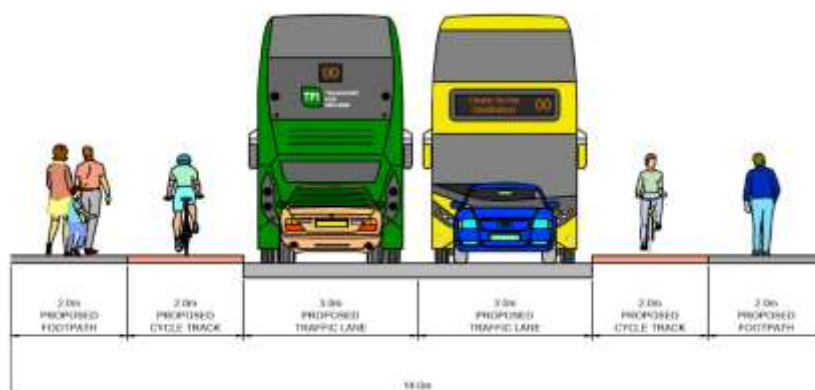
Typical Traffic Management Cross Section (C-C)
